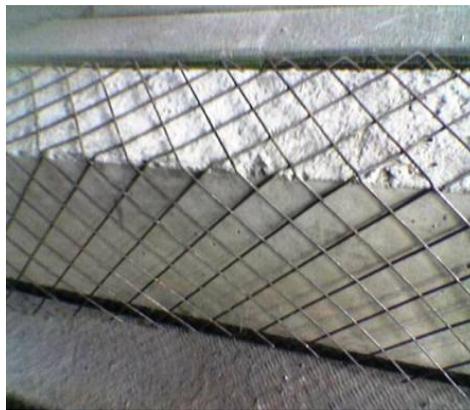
Longitudinal and Cross-Section of Retrofitted Beams
